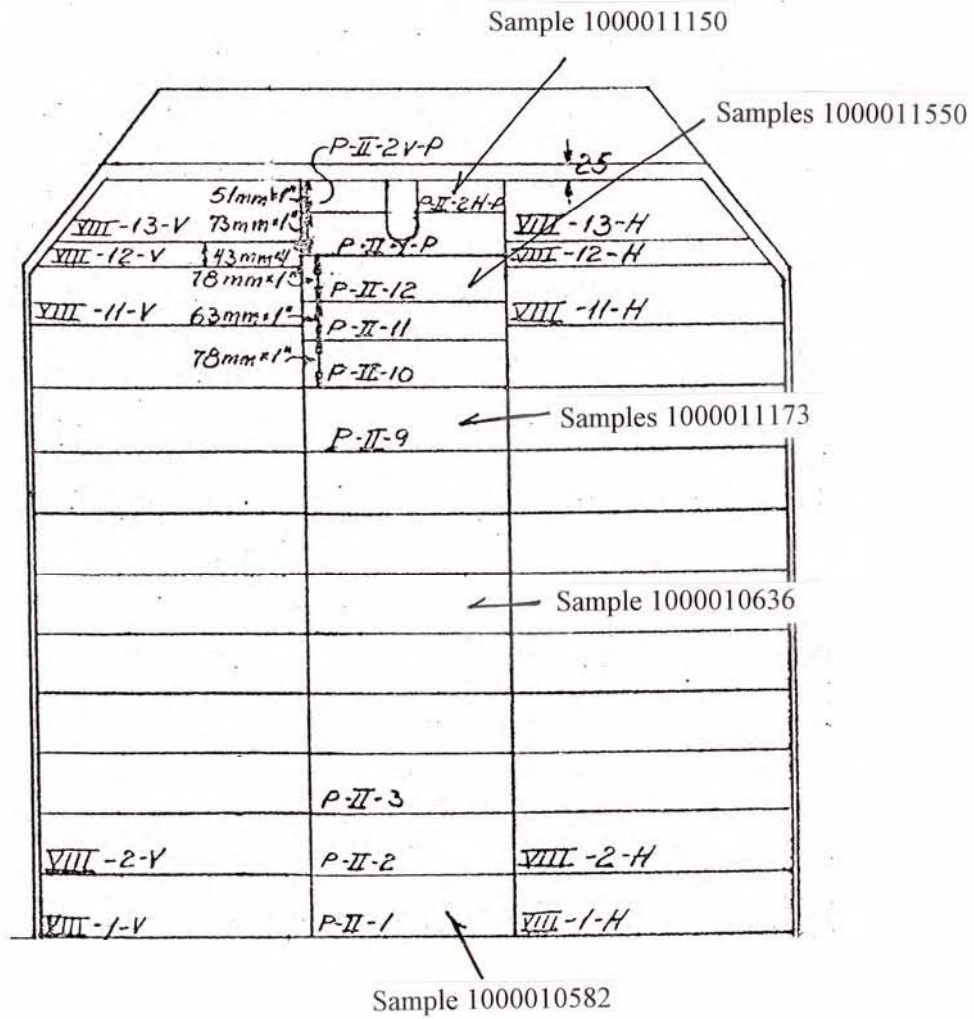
Horizontal cross section of the 8th layer of the thermal column of DR2 giving the positions from where samples were taken.
